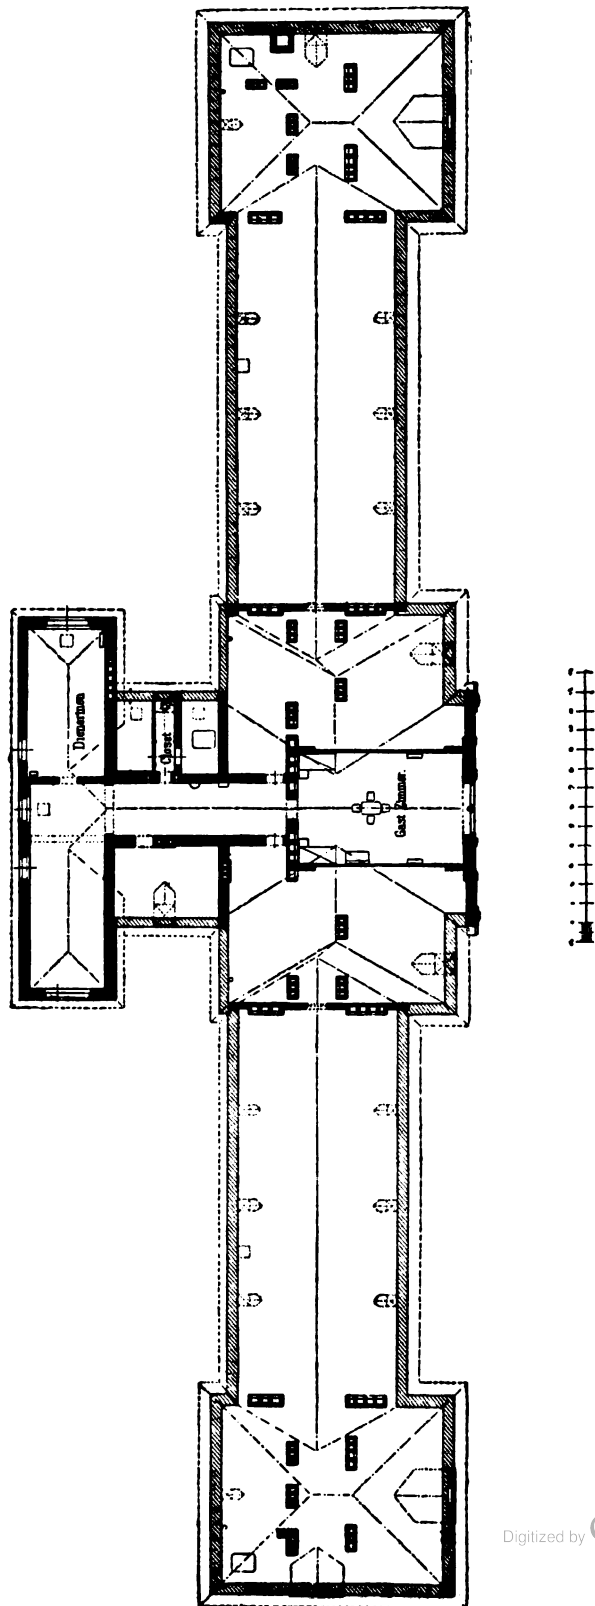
/.—ALLAND SANATORIUM.—ATTIC FLOOR.
